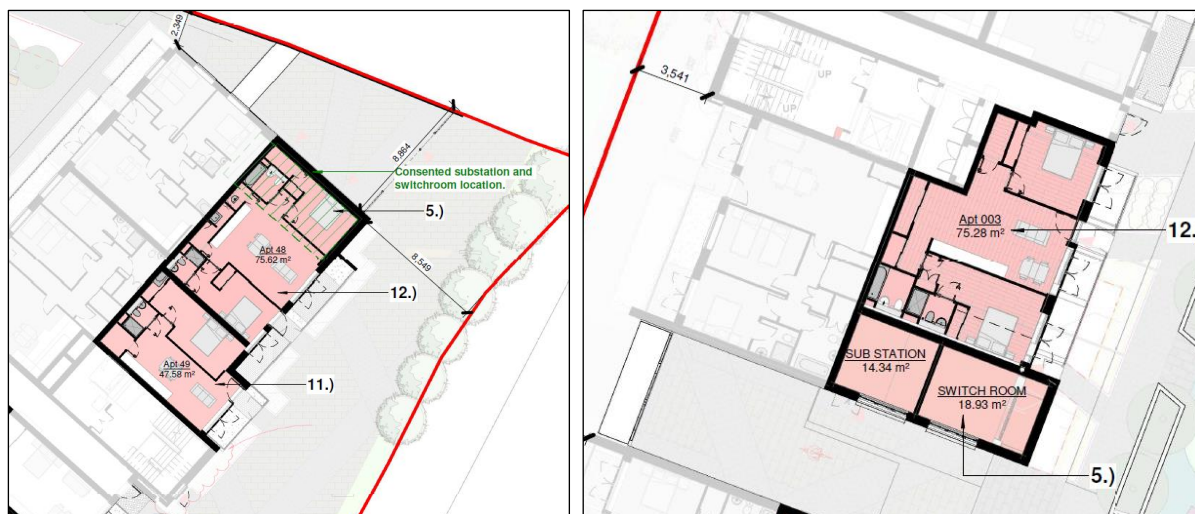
Excerpt from ground floor plan of development proposed under S146B amendment illustrating amendments to Block D (left) and Block A (right) to facilitate relocation of substation and switch room
